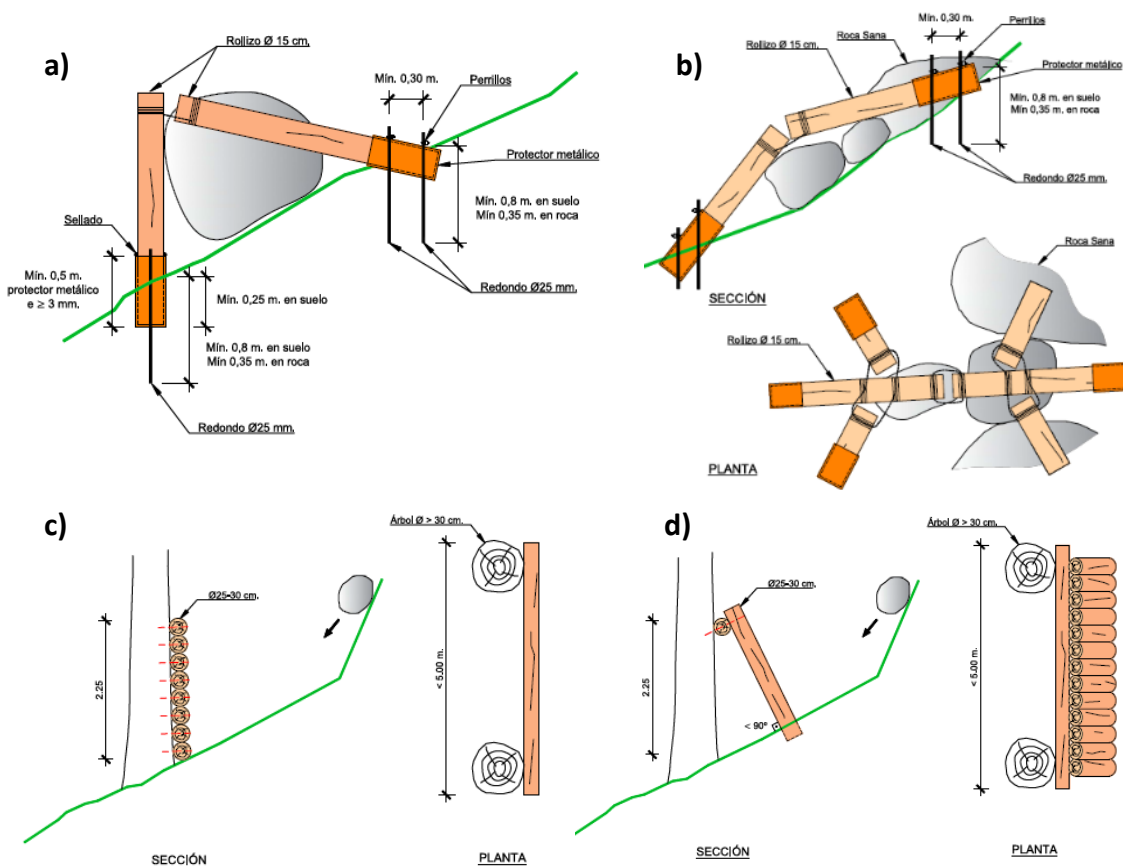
Examples of designed NBS consisting of in (top) rock fixing structures and (bottom) passive rockfall barriers. a) wooden tripods fixing individual boulders; b) wooden meshes fixing grouped boulders; c) rockfall wooden barriers with a horizontal pattern; d) rockfall wooden barriers with a vertical pattern.
